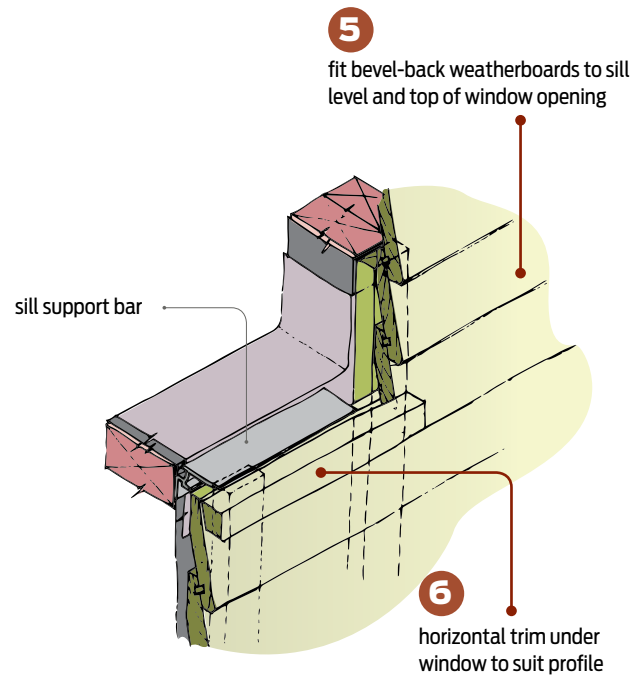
Steps 5–6: Fix cladding to sill level and top of window.
